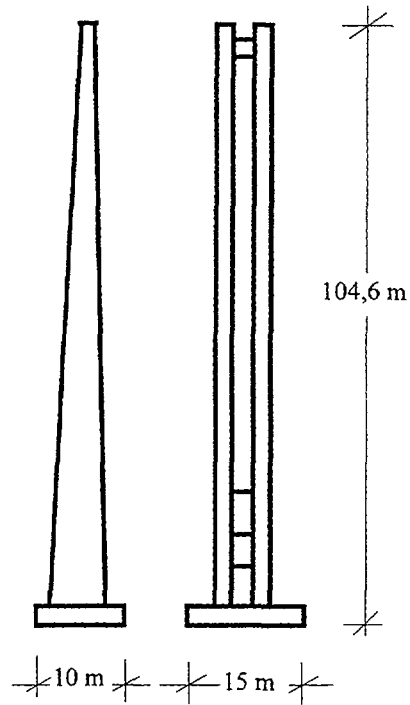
Flexible reinforced concrete structure: Ventilation chimney
